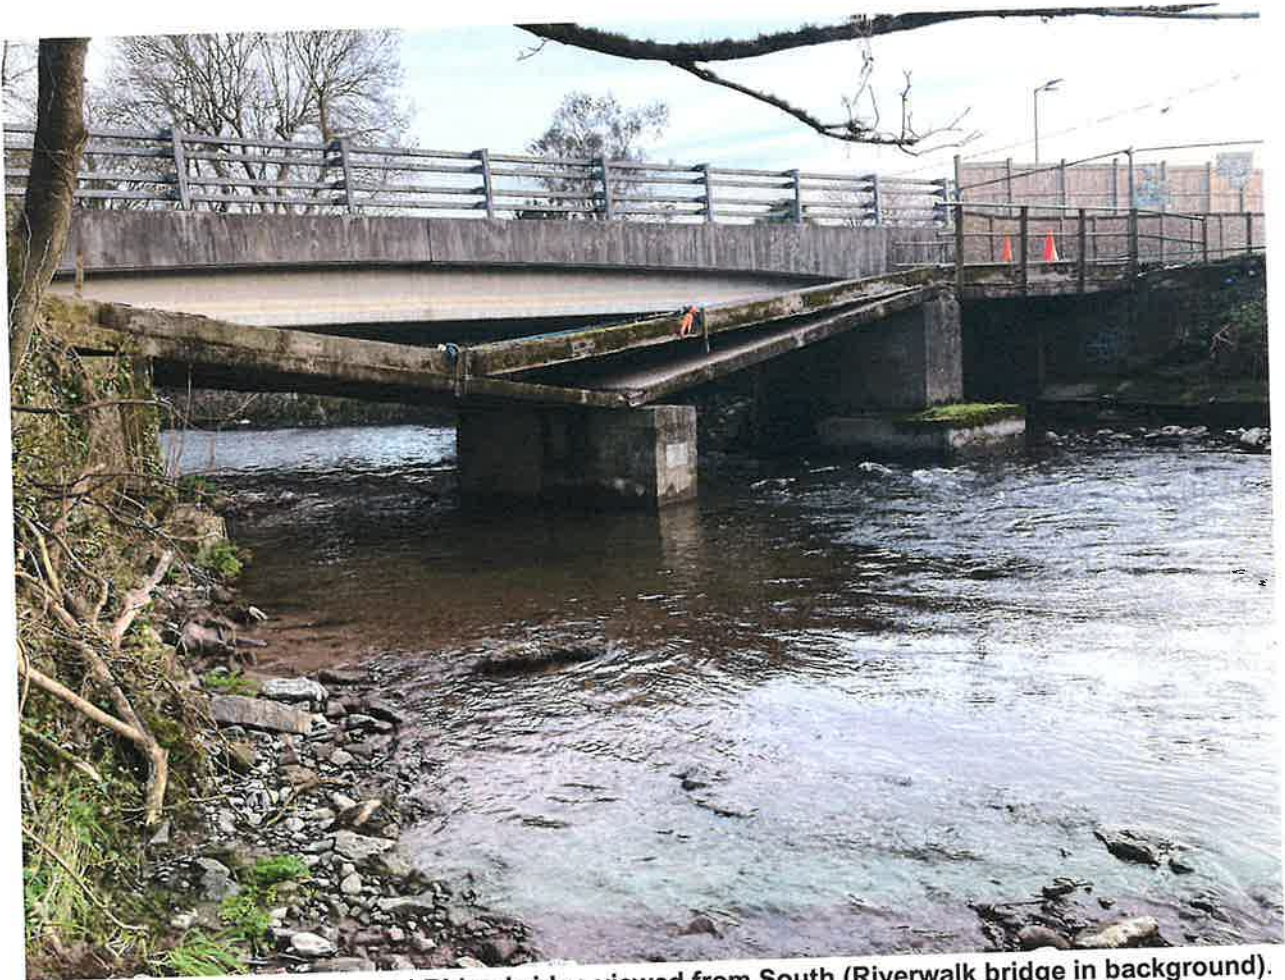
Damaged Broomfield Ridge bridge viewed from South (Riverwalk bridge in background).
